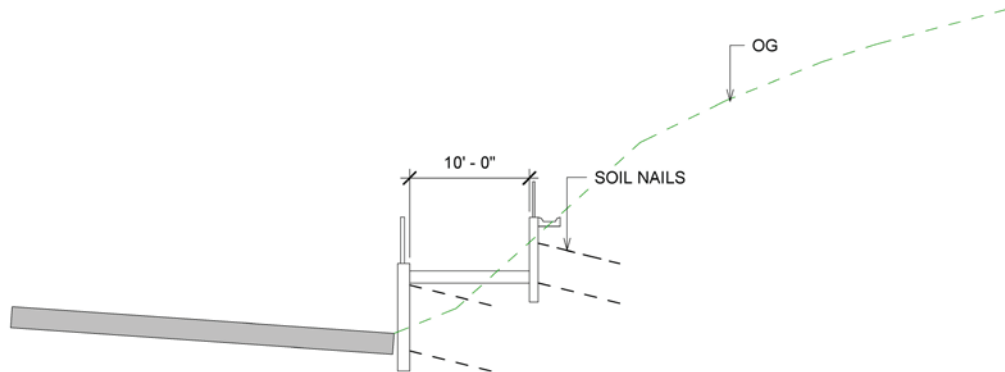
Two-tier wall system with tie backs schematic (exhibit from P. Preston)
